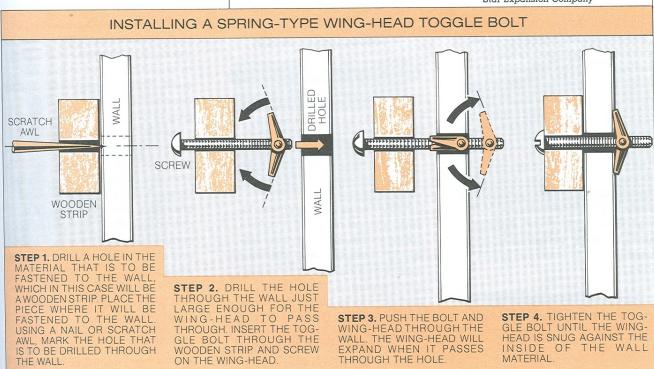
Installing a spring-action wing-head toggle bolt. The wing-head assembly folds back as it is pushed through the hole, then springs back inside the wall cavity.
